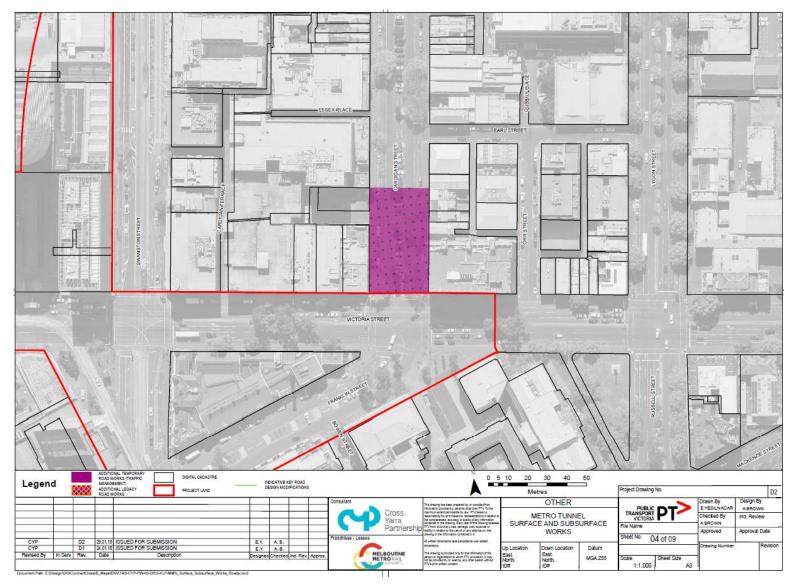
CARDIGAN STREET ADDITIONAL ROAD SURFACE WORKS
